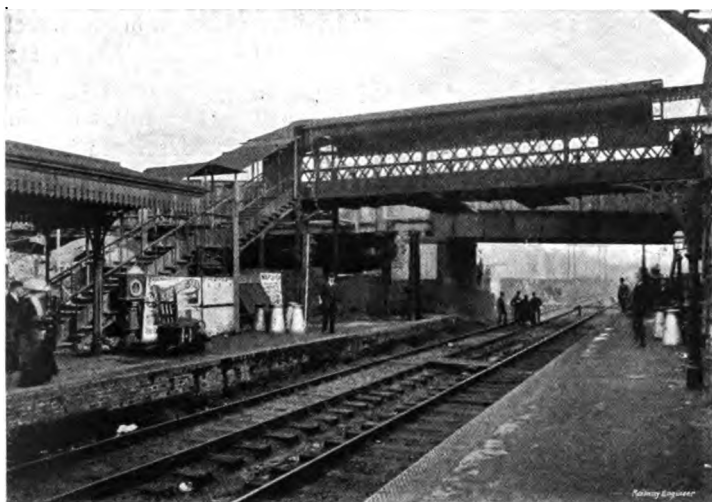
Staircase and Footbridge at Plaistow Station before re-building.
